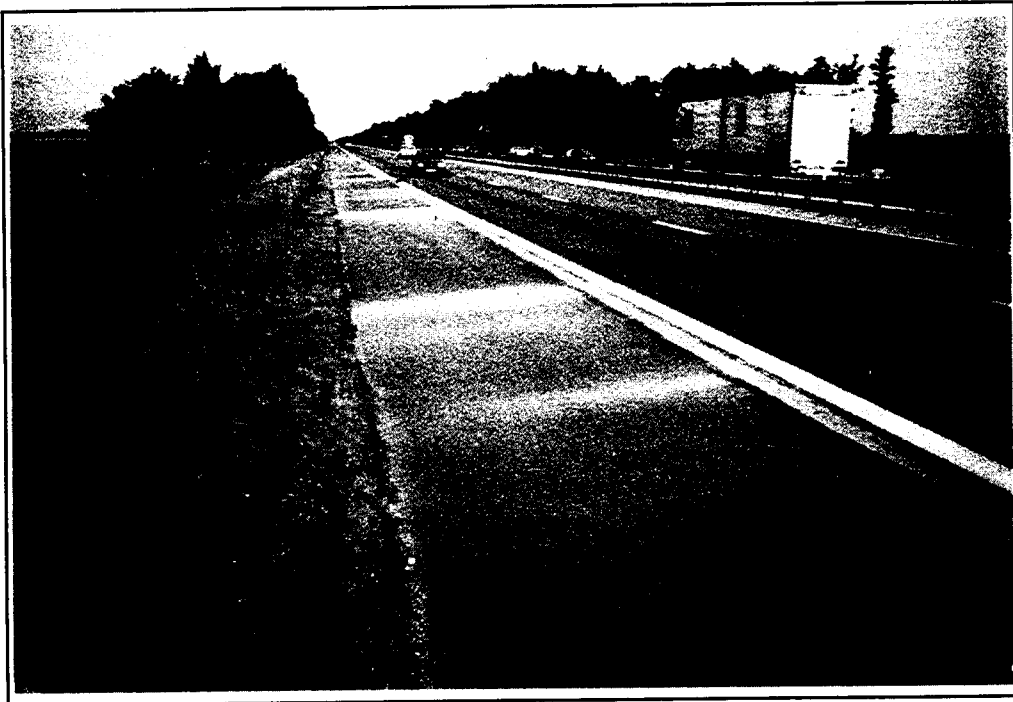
The A-31 autoroute south of Dijon. The base of this semi-rigid pavement has begun to pump through the transverse cracks in the asphalt surfaced pavement.
